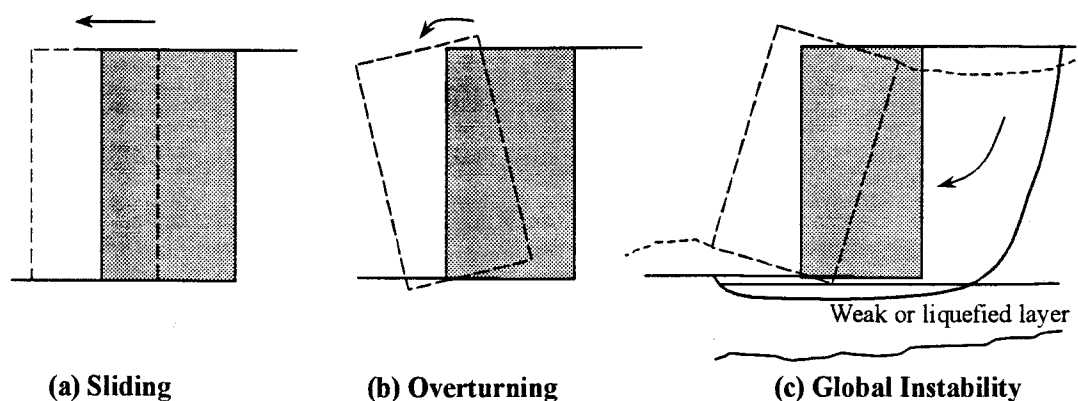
Typical failure mechanisms for gravity type retaining walls
